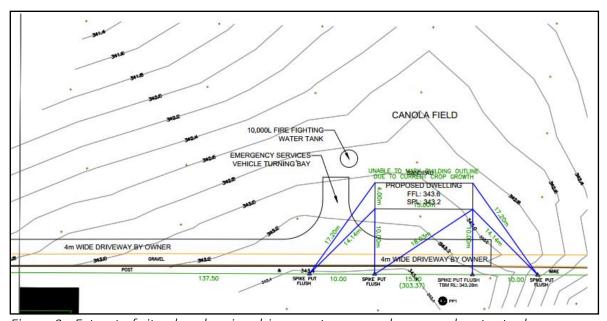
Extract of site plan showing driveway, turnaround area, and water tank
